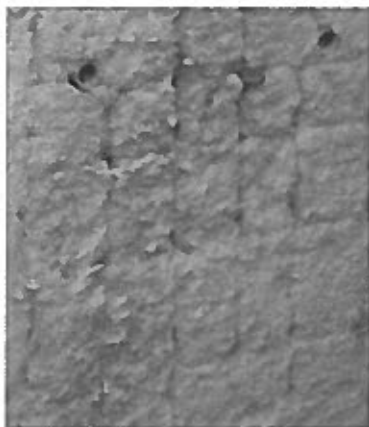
Mattressing (retaining wall width: 1-2 m)[1]
